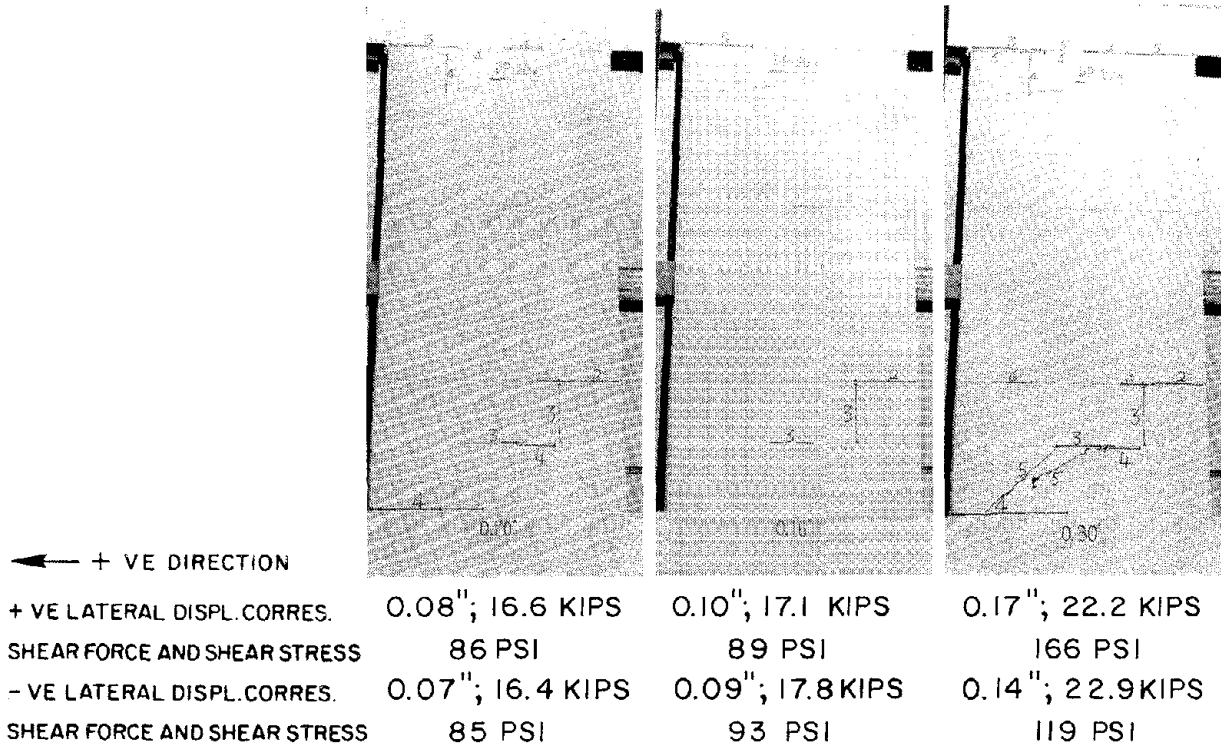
SUCCESSIVE CRACK FORMATION TEST 17. (RIGHT SIDE PIER)
